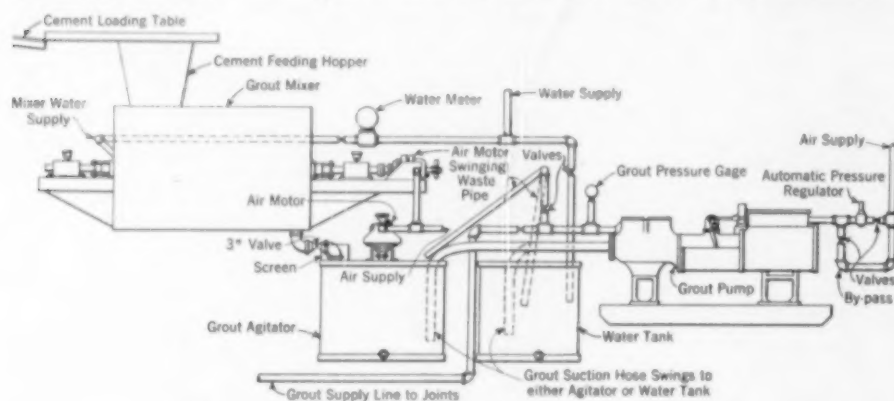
SCHEMATIC LAYOUT OF PLANT FOR MIXING AND PLACING GROUT
